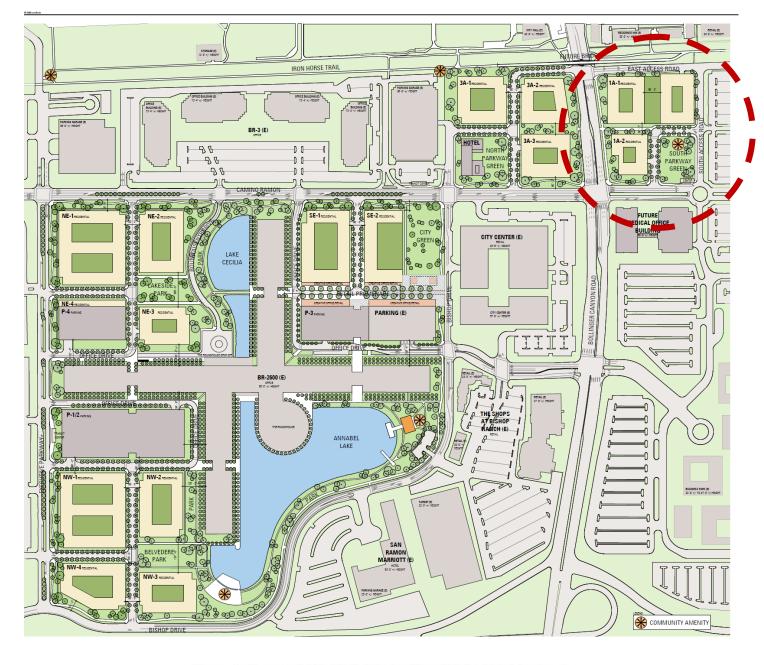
Proposed CityWalk Master Plan BR-1A Neighborhood
